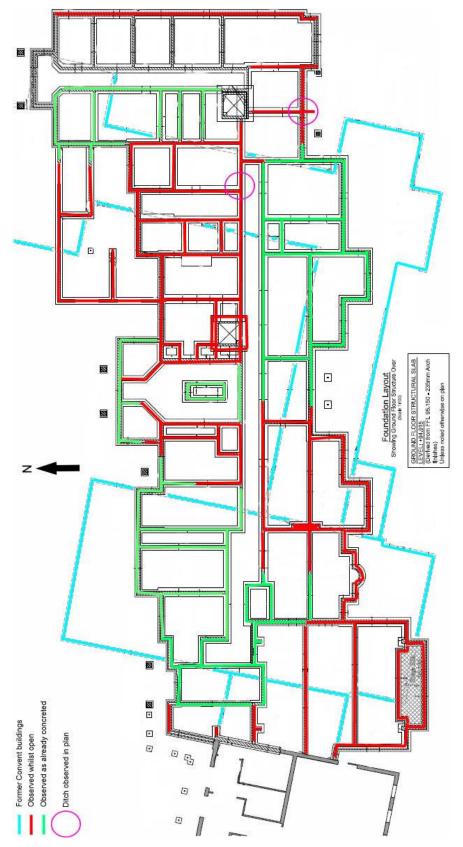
Foundation plan of the new buildings showing observations made during the watching brief (provided by Beard Construction, OPUS Drg No. 200/R3)
